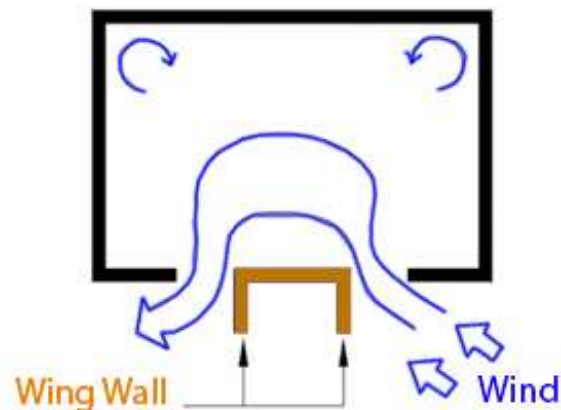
The illustration of wing wall applied for natural ventilation enhancement in building [17].
